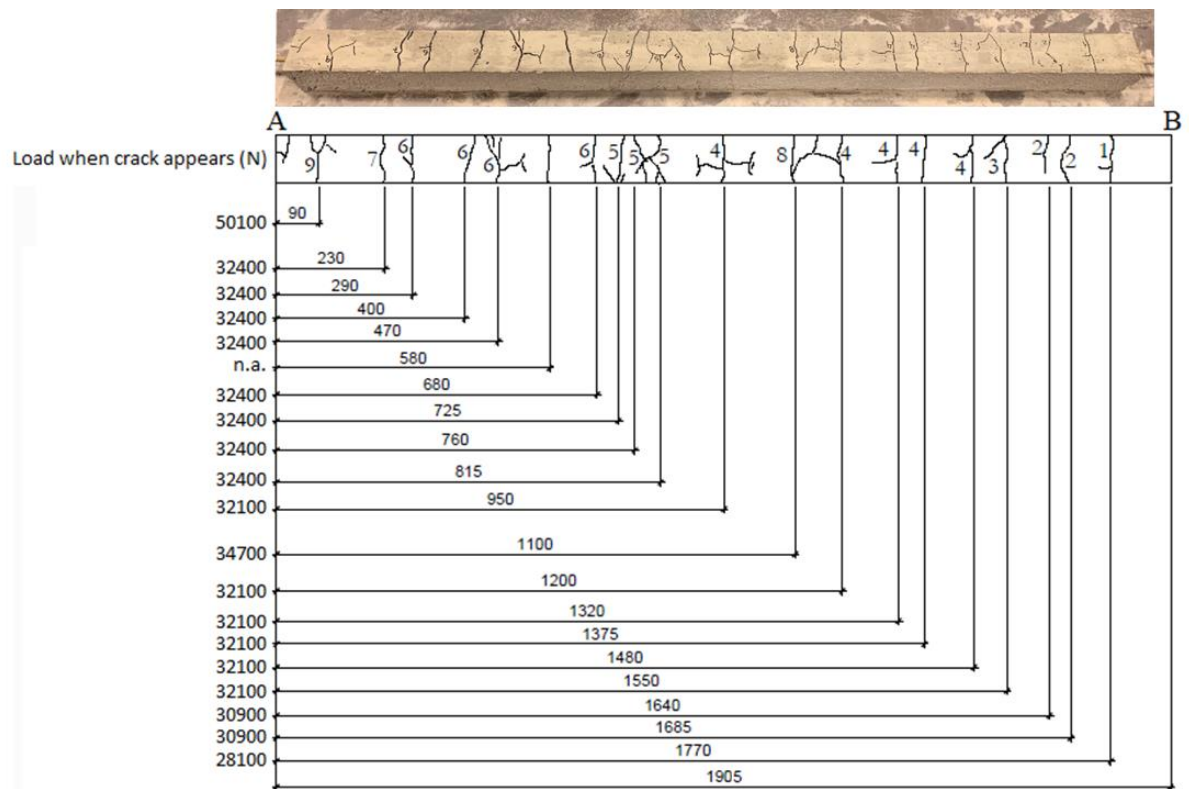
Prism test and crack pattern: #4 sGFRP – specimen 1.
